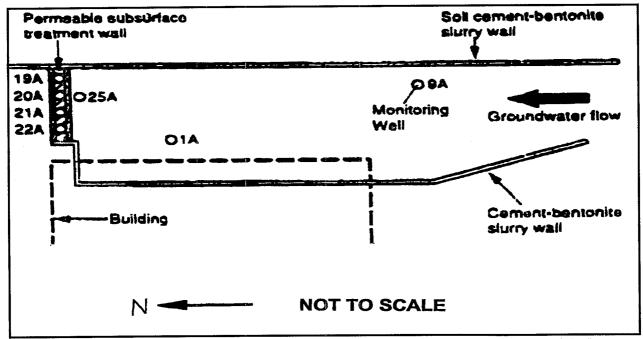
Plan View of the Treatment and Slurry Wall System (Best Copy Available) [16]
